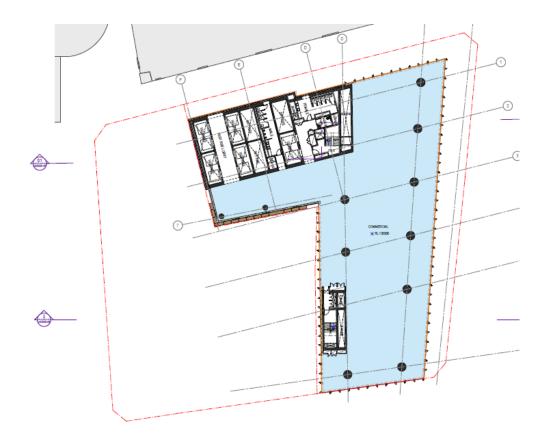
Proposed Level 30-42 - typical high-rise commercial office floorplate
